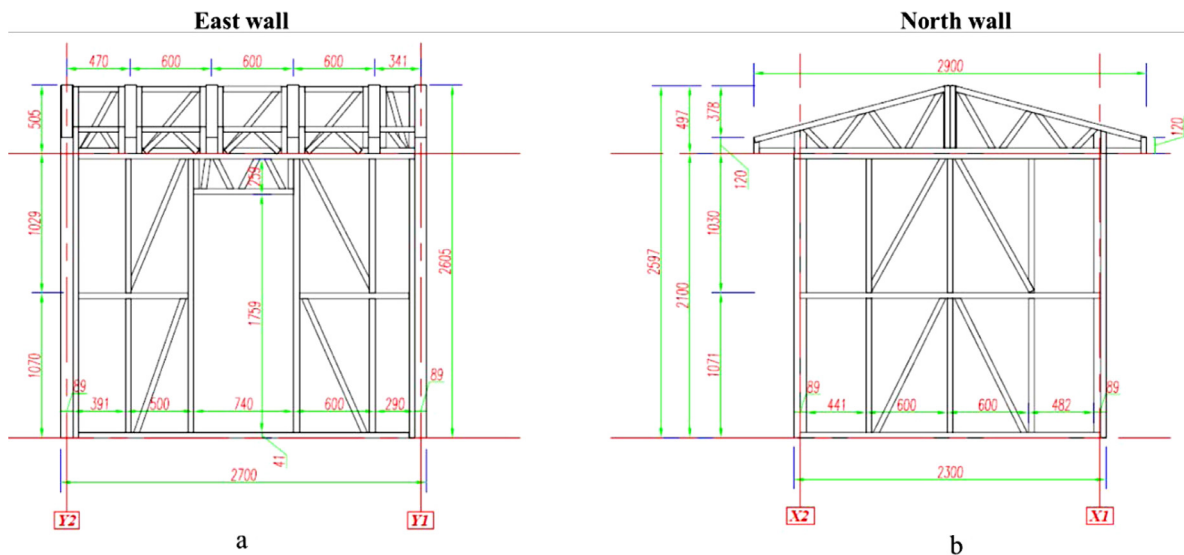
Front views of the walls: (a) East wall, X1 direction; (b) North wall, Y1 direction.
